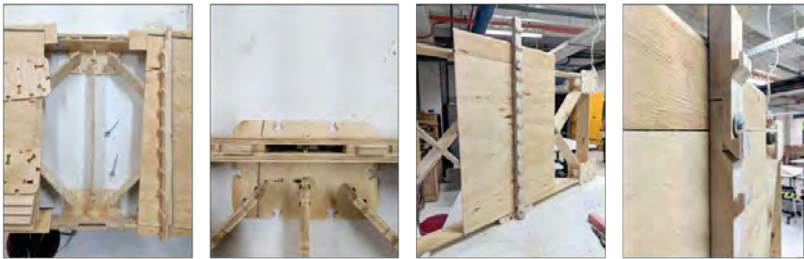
Early Stage ‘mock-up’ tests (from left to right: Frame Parts (tolerance test), Structural Cavity Batten Fixing, Rigid Air Barrier Testing, integrated weatherboard fixing).
